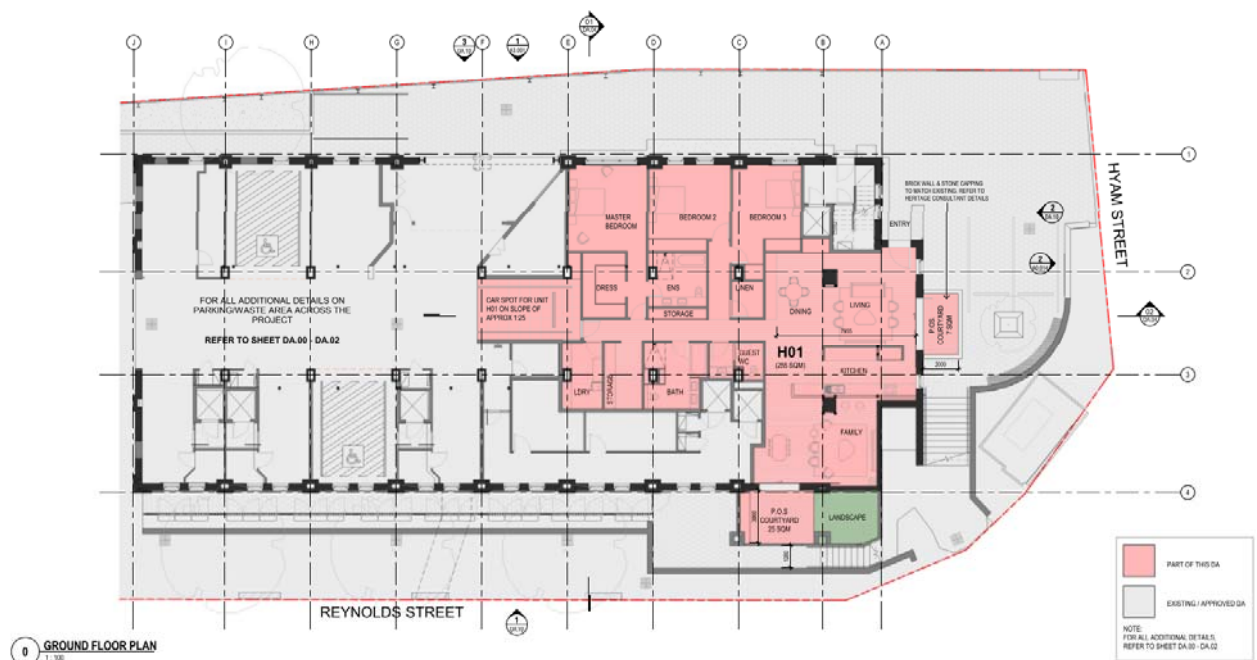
Proposed ground floor change of use from retail to residential at 100-104 Reynolds Street.
